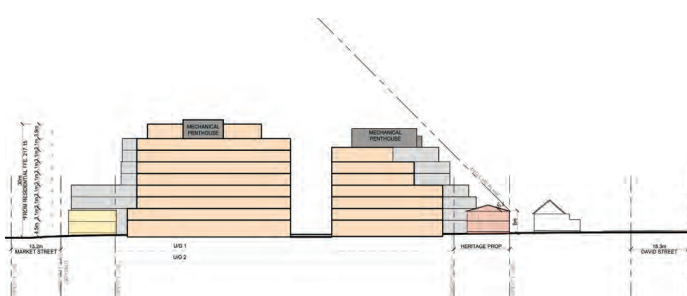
Building Stepping and Heights, Main Street North Building Wall
